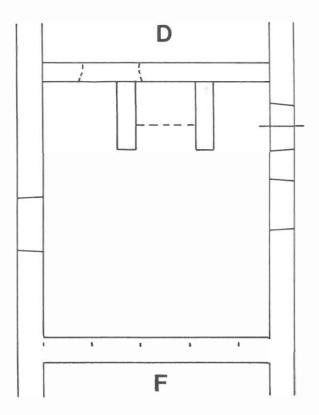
Site plan of Room E, with the newly installed hearth IIA, after about 1830.
